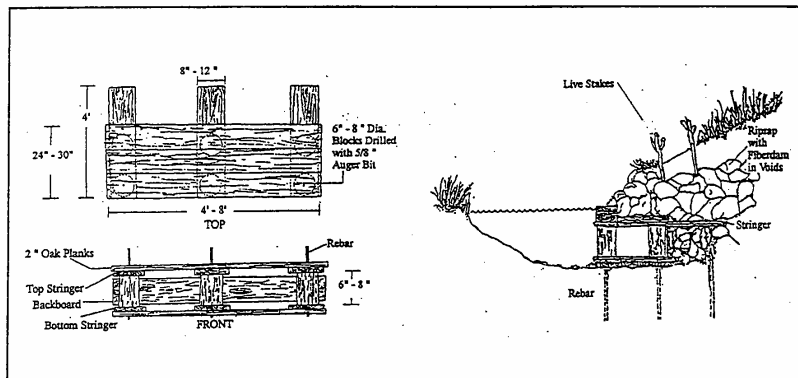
Construction of a lunker structure (Source: DuPage County Streambank Stabilization Program)
